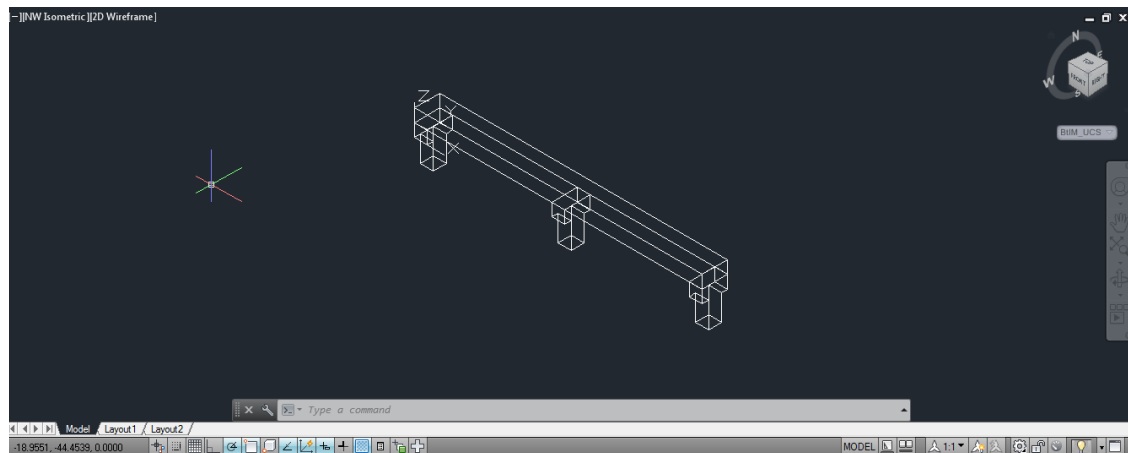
3D Extruded Wireframe of a Beam/Girder Bridge
